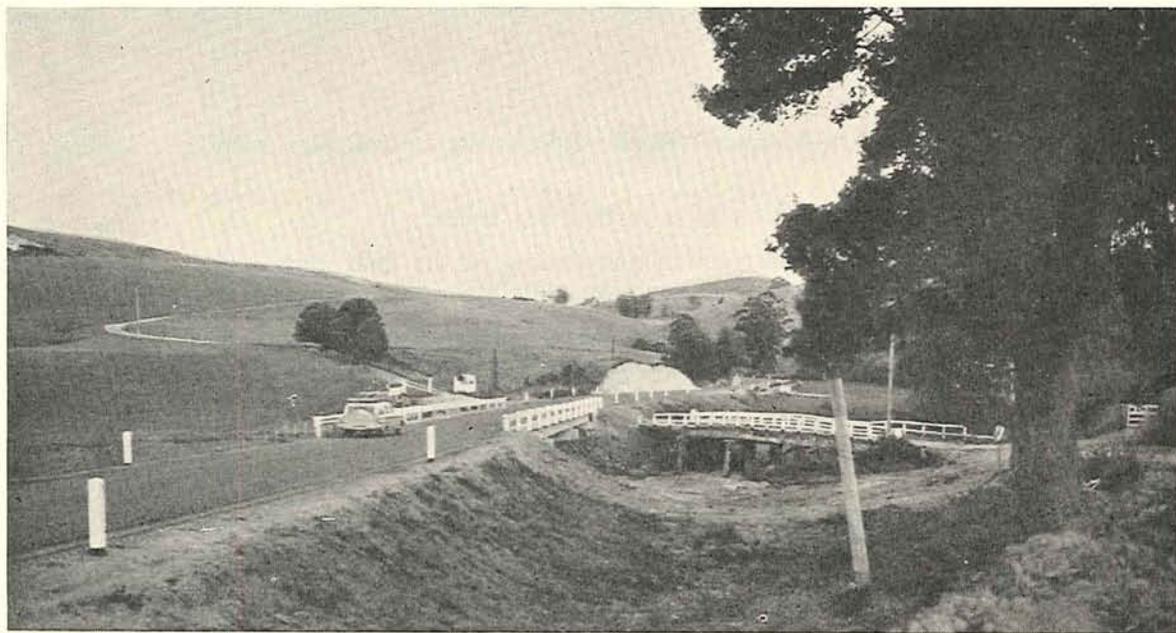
Morwell Shire—New bridge and approaches on the Morwell River Road south of Boolarra.
